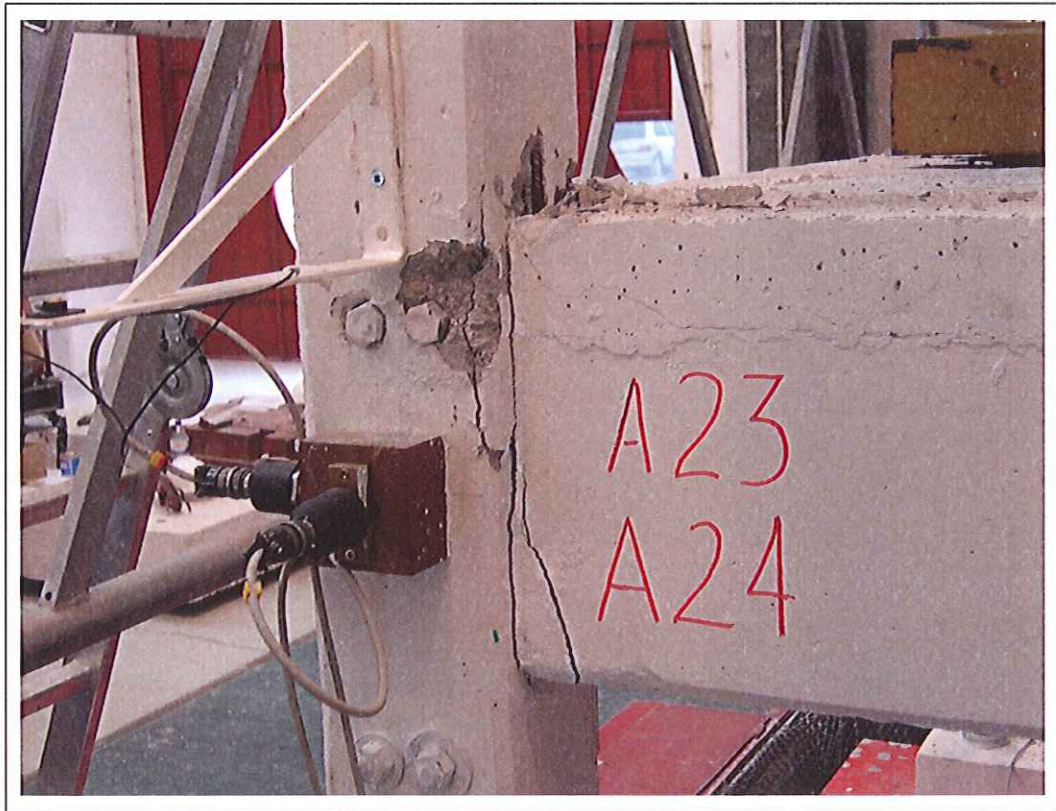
Detail of the beam-column connection after the test (J10-Long.)
